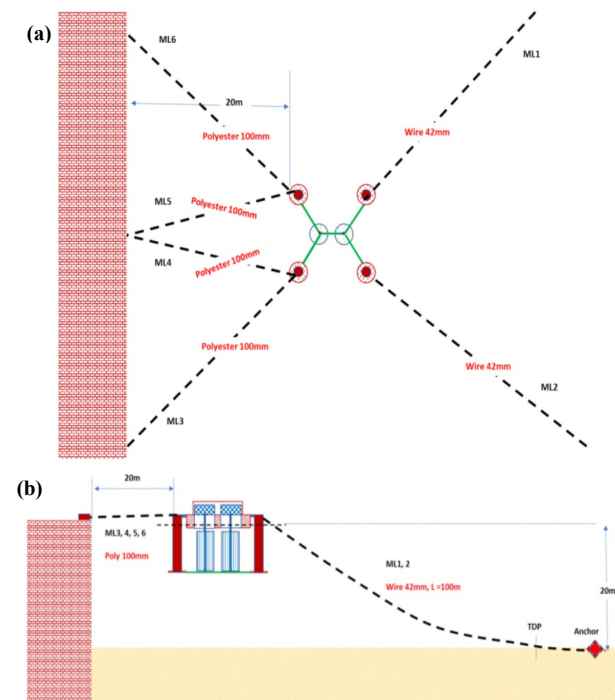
Base platform mooring layout (plan view (a) and elevation view (b)).
